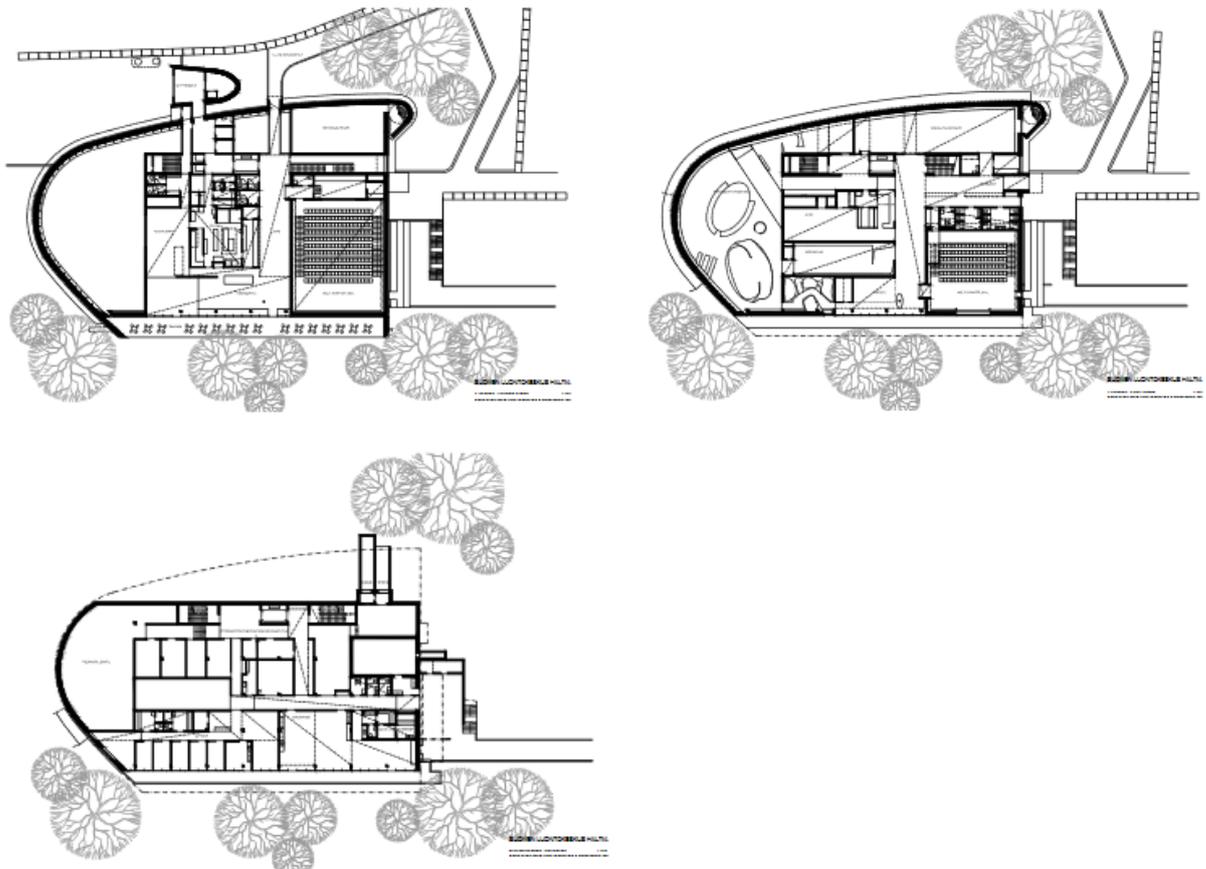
The floor plans. Starting from the top left: second floor, first floor, and ground floor (Mahlamäki, 2013, p. 11)
